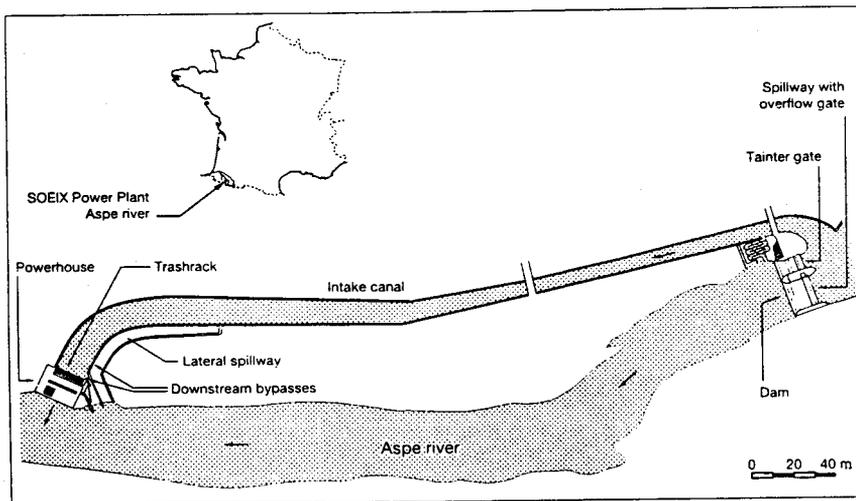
Plan view showing the hydroelectric plant : dam, intake canal and powerhouse, location of downstream migration bypasses.
